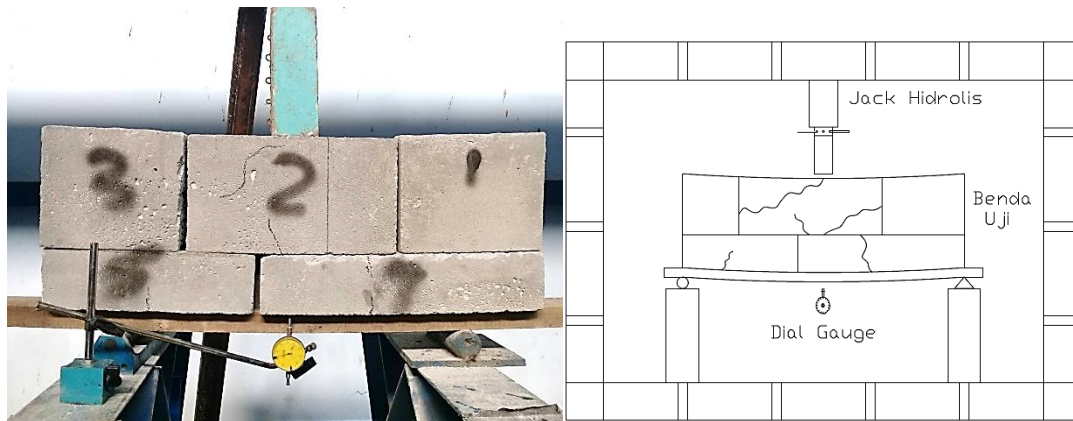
Flexural strength testing of lightweight interlocking brick wall.
